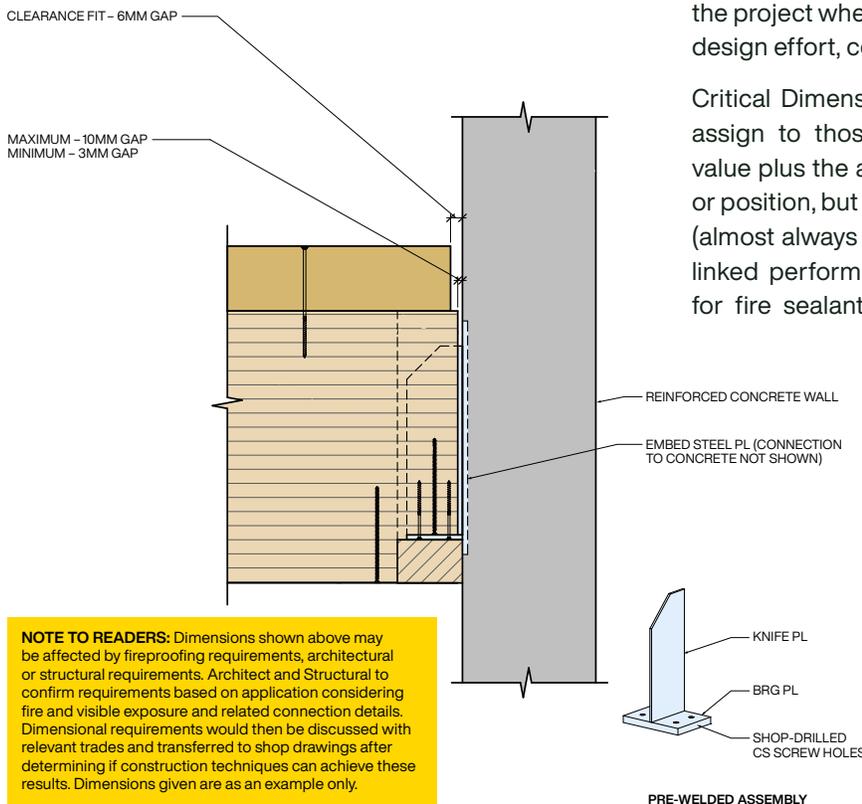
Steel knife plates fit into prefabricated glulam assemblies include clearance fits around steel to ensure installation.
